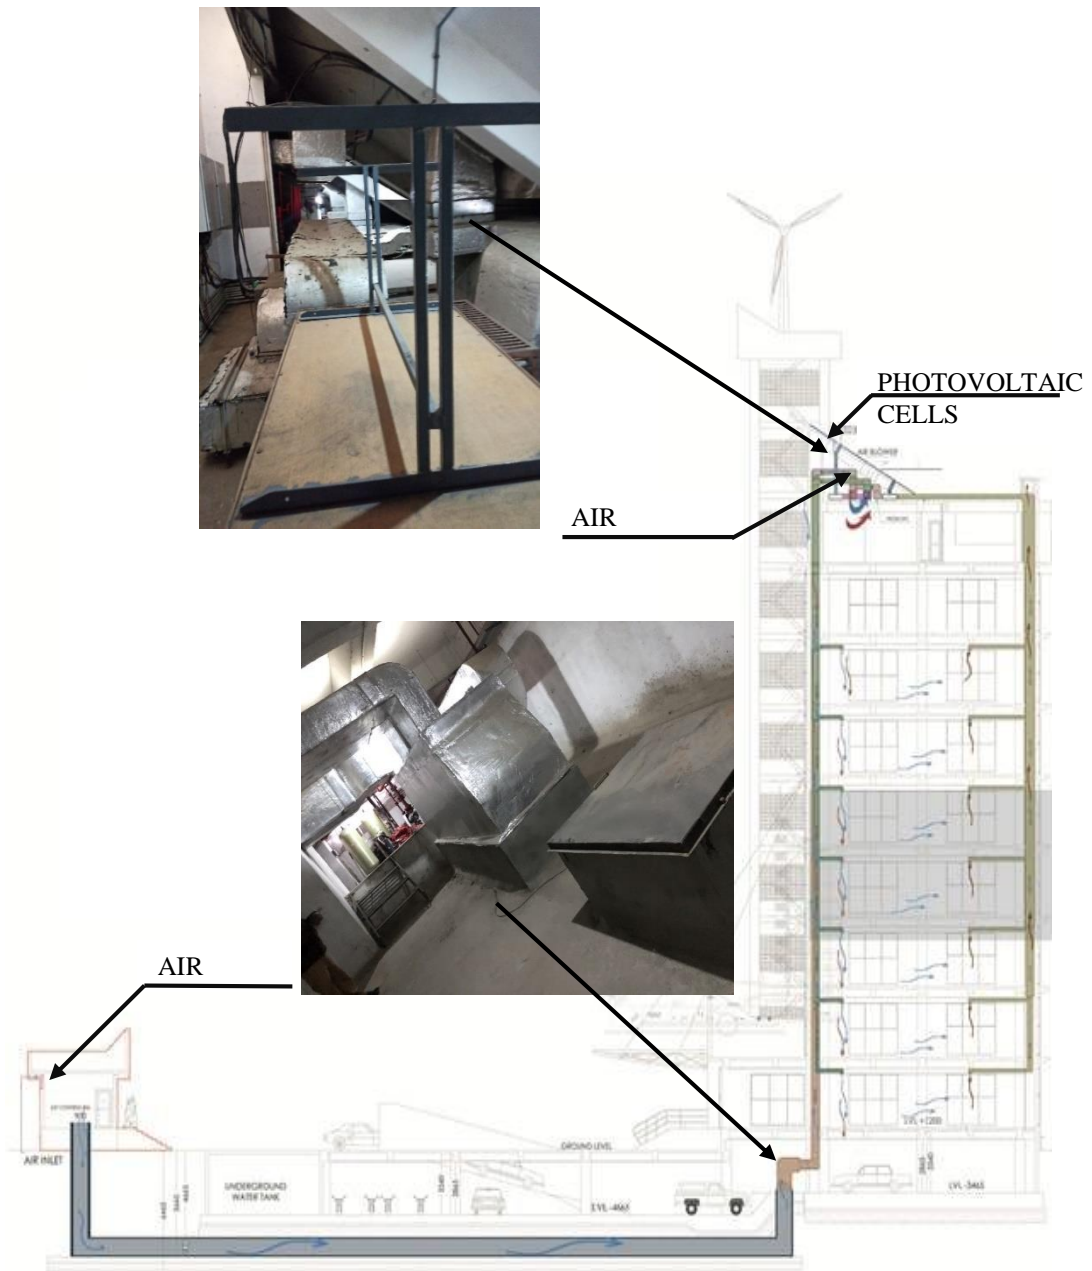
Section Showing Earth Air Tunnel (Source: archinect.com)
